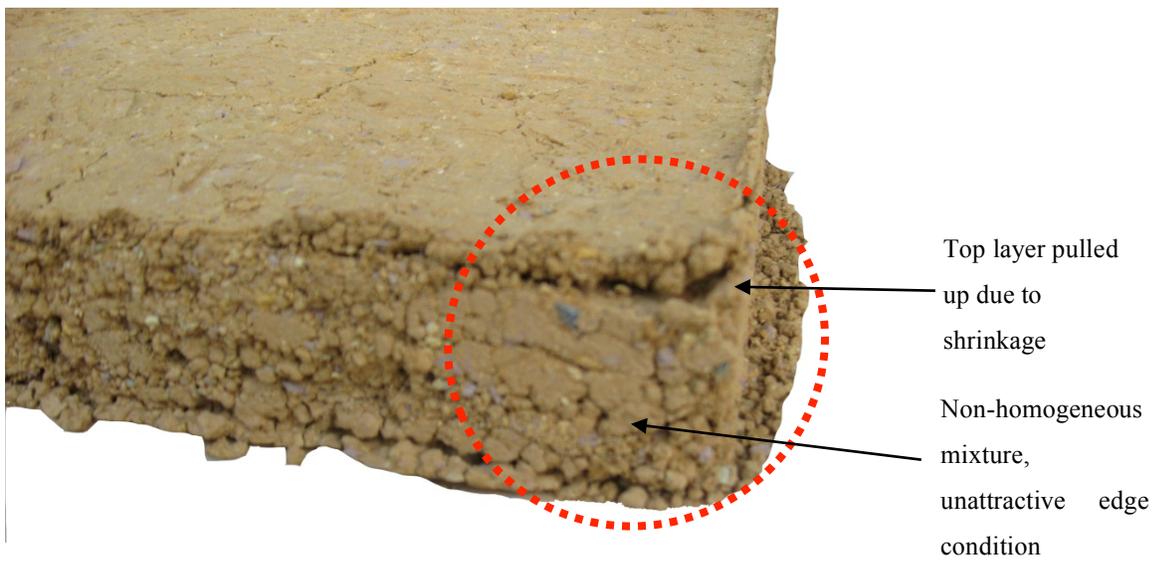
Corner detail Panel-4 Earth + Elmer's glue + Clay
